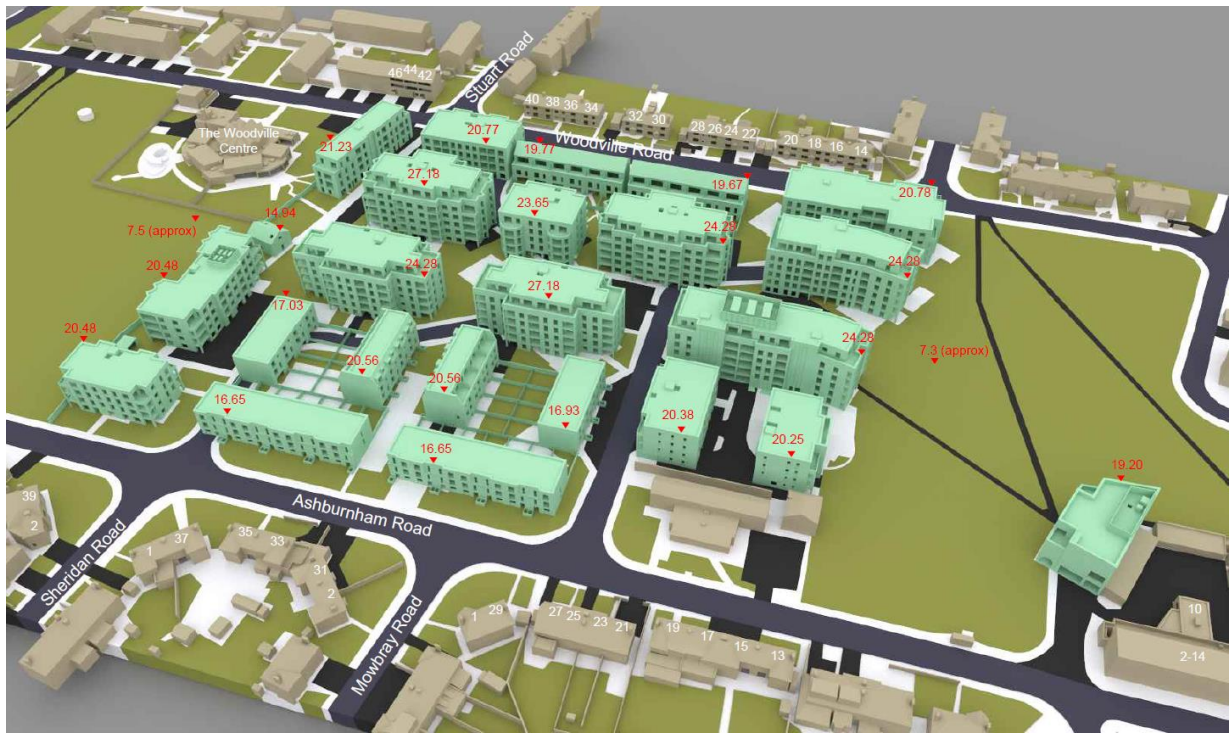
Site Plan of the Proposed Development, illustrated in green
